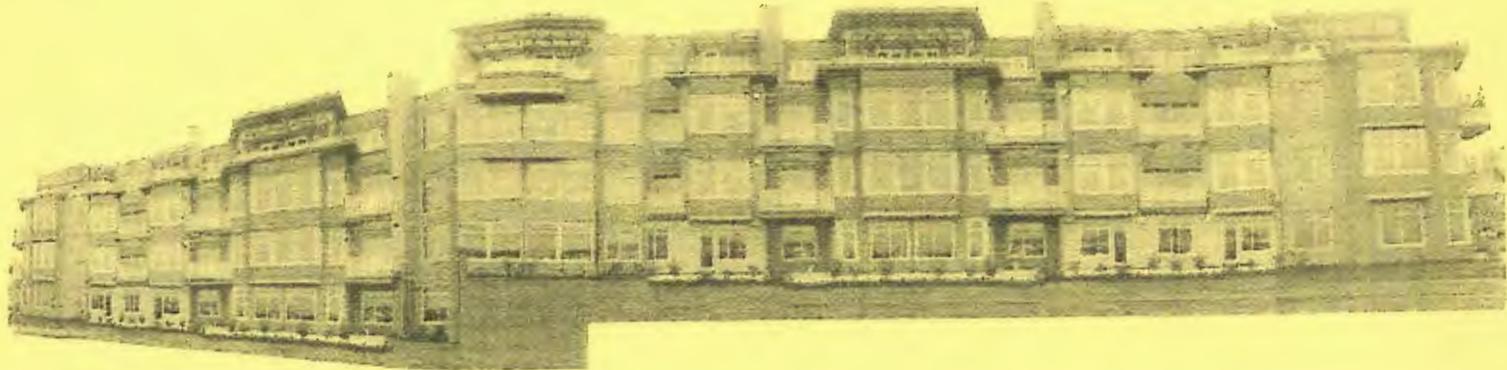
PHOTO COMPOSITE OF PROPOSED BUILDING 10 - ORIGINAL PLAN
